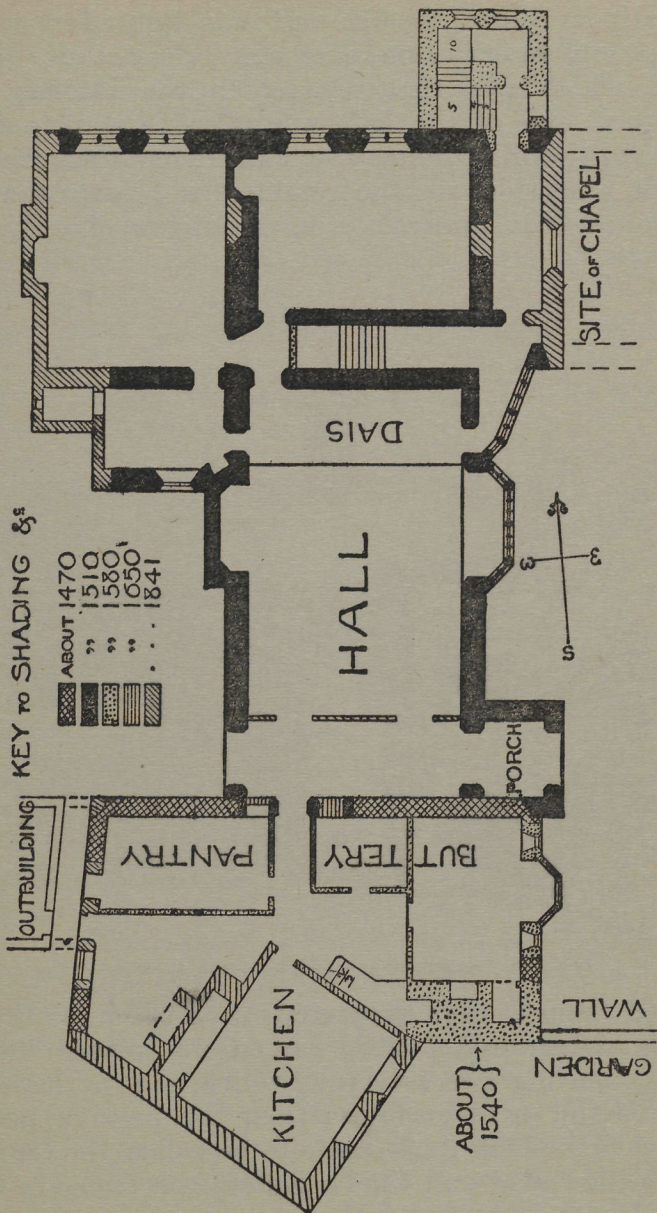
TYPICAL MEDIEVAL HOUSE PLAN
